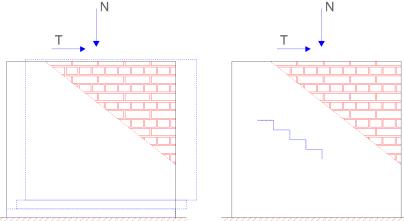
Failure shapes regarding in plane loaded panel, first in Sliding & second in diagonal shear stress
